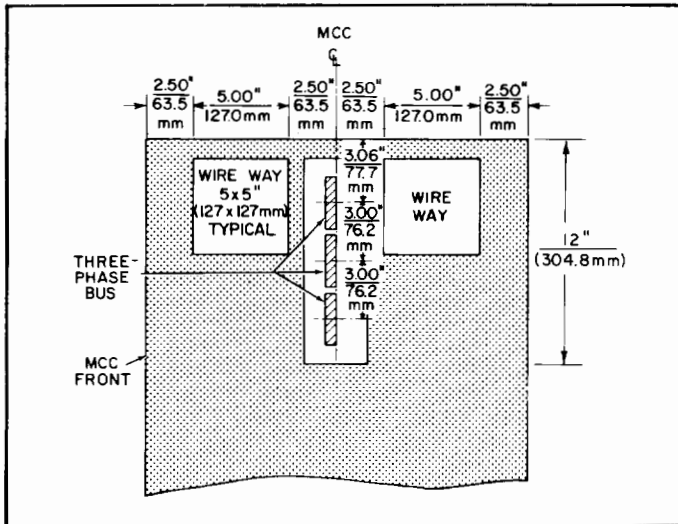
Side view showing top area dimensions for 20-inch (508 mm) deep section with 2-inch (50.8 mm) bus bars.
